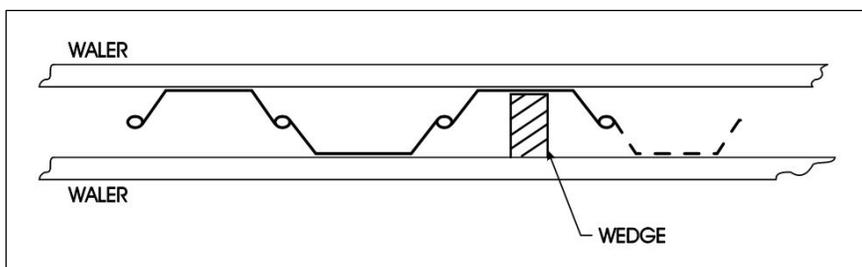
6: Guiding Sheet Piles with Walers and Wedge
